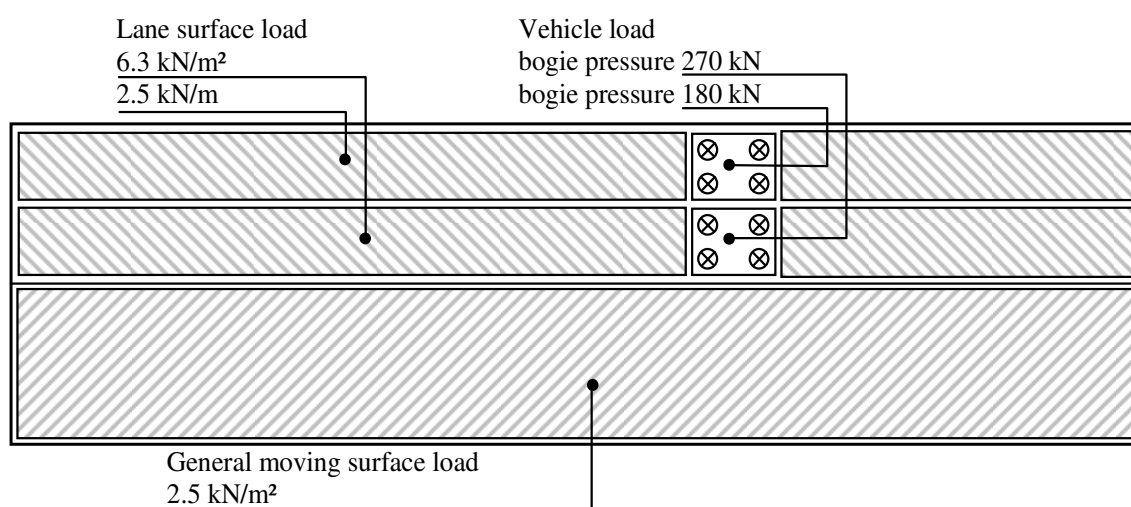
Example of one load combination of load model 1 acting on the bridge.
